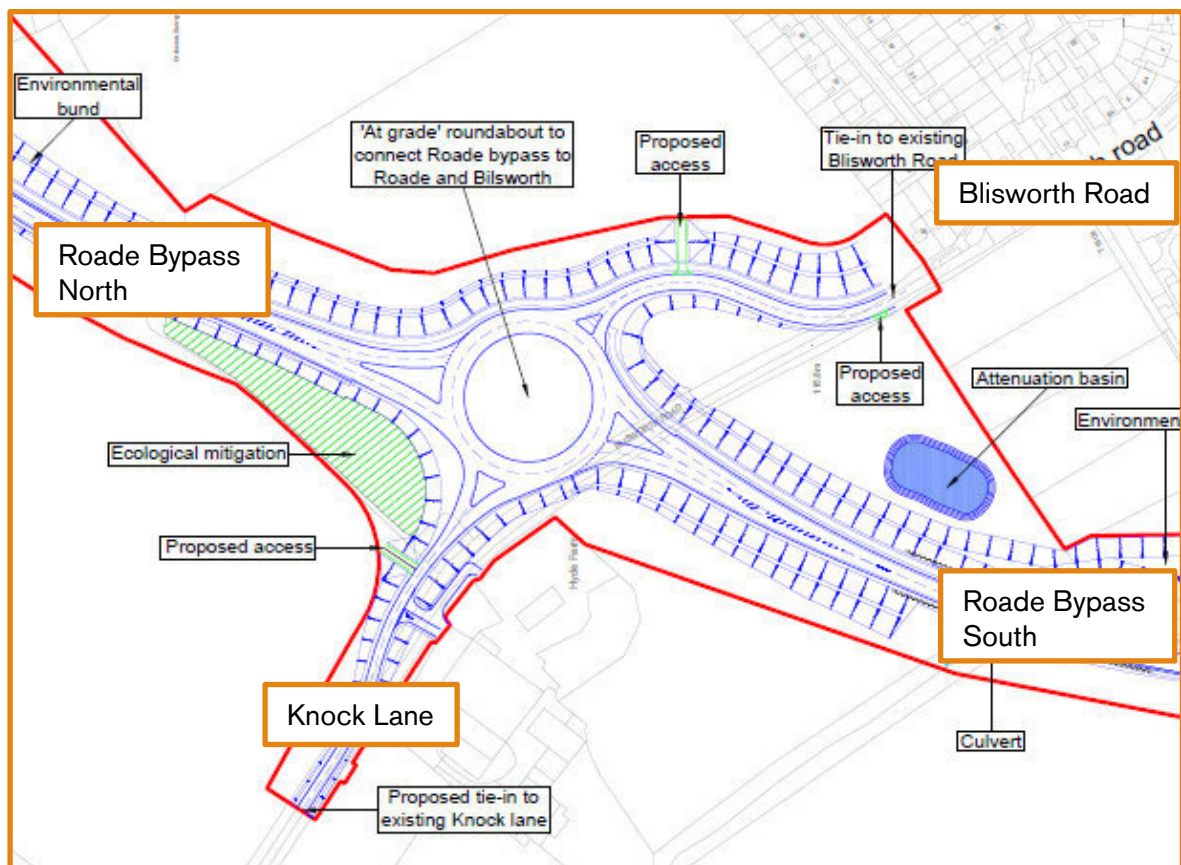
Blisworth Road/Knock Lane/Roade bypass 4-arm roundabout
